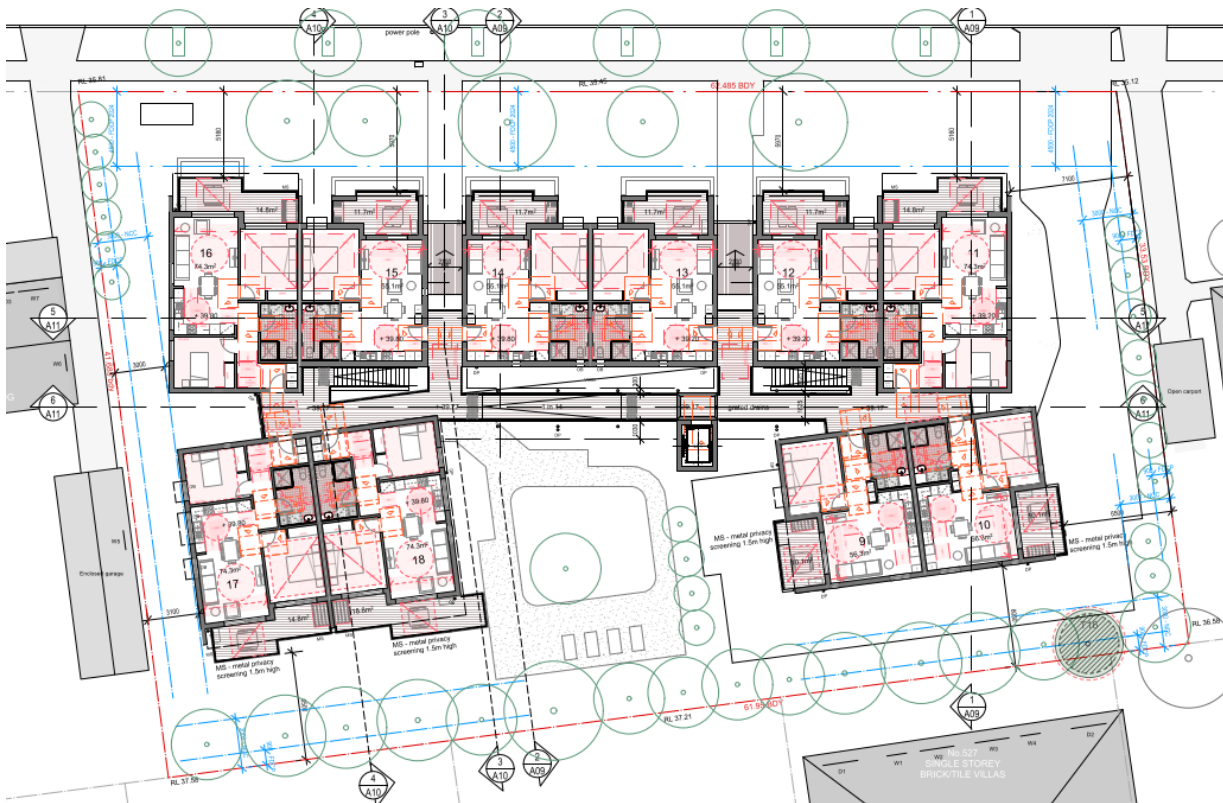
Extract from Architectural Plans –First Floor Plan (Source: Architectural Plans, McGregor Westlake Architecture, dated 04.04.25)
